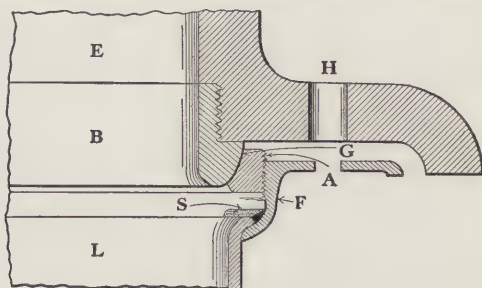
GROUND-JOINT METAL-TO-METAL WATER CLOSET FLOOR CONNECTION
